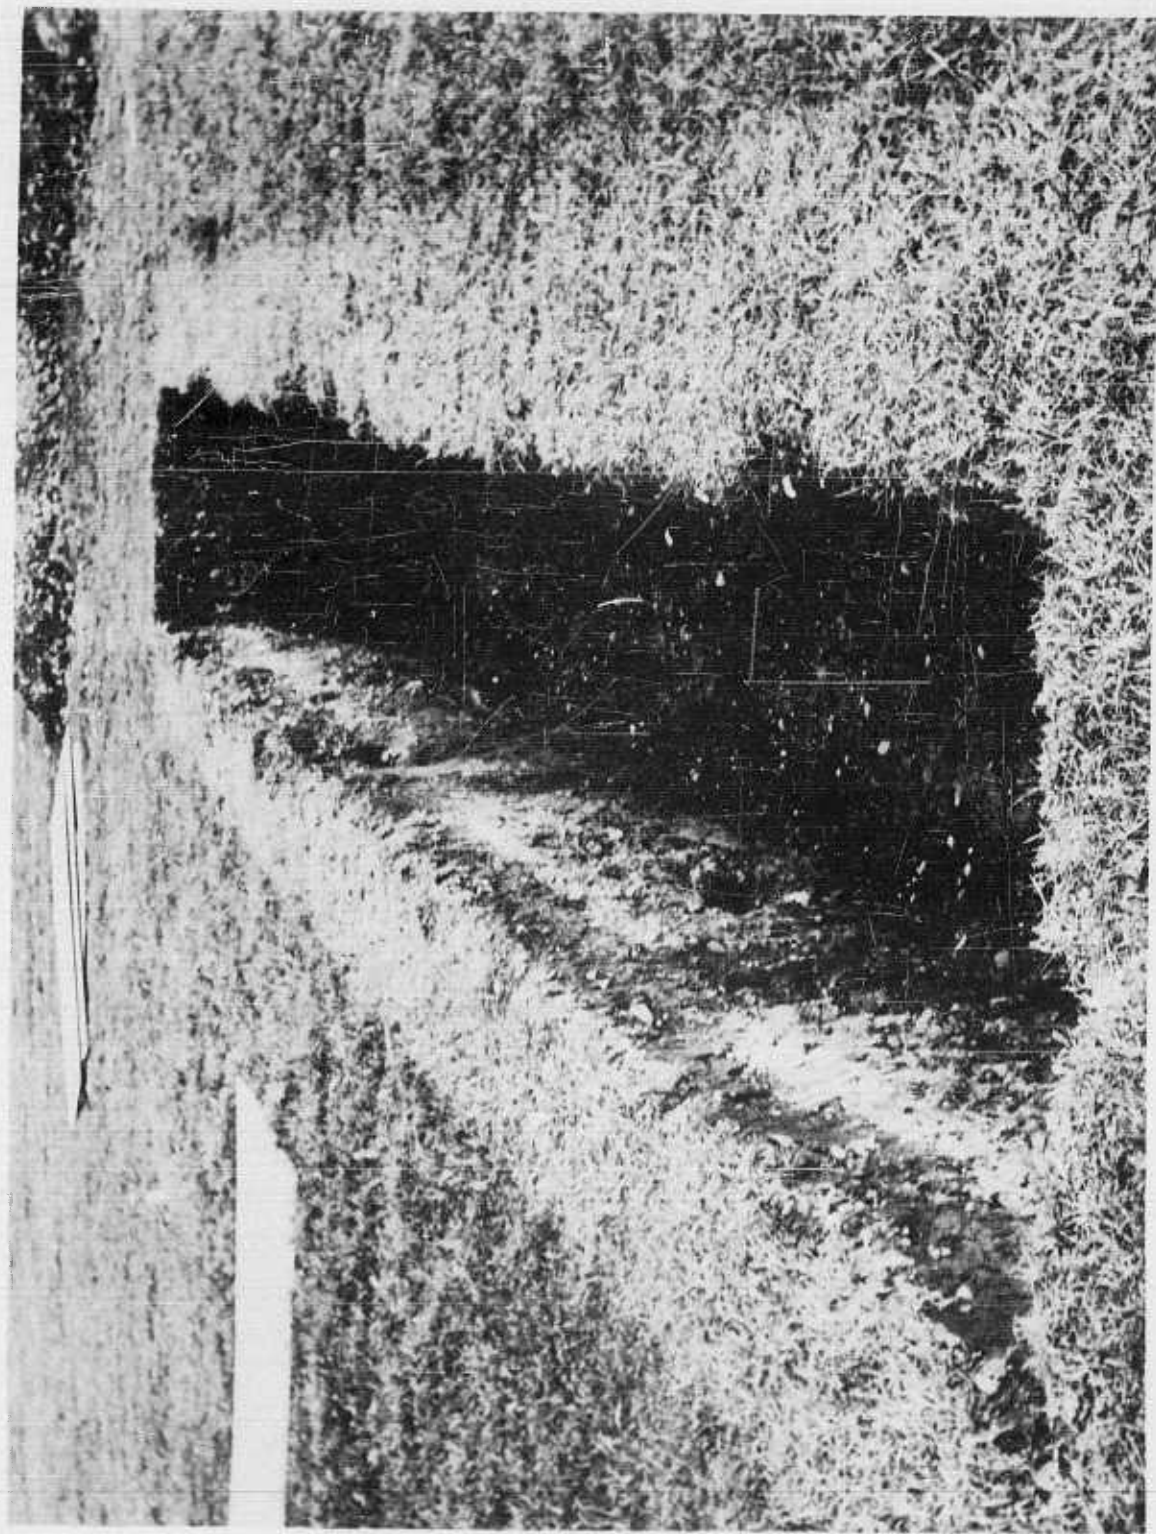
INDIVIDUAL DITCH 4 FEET WIDE, 4 FEET DEEP AND 30 FEET LONG
